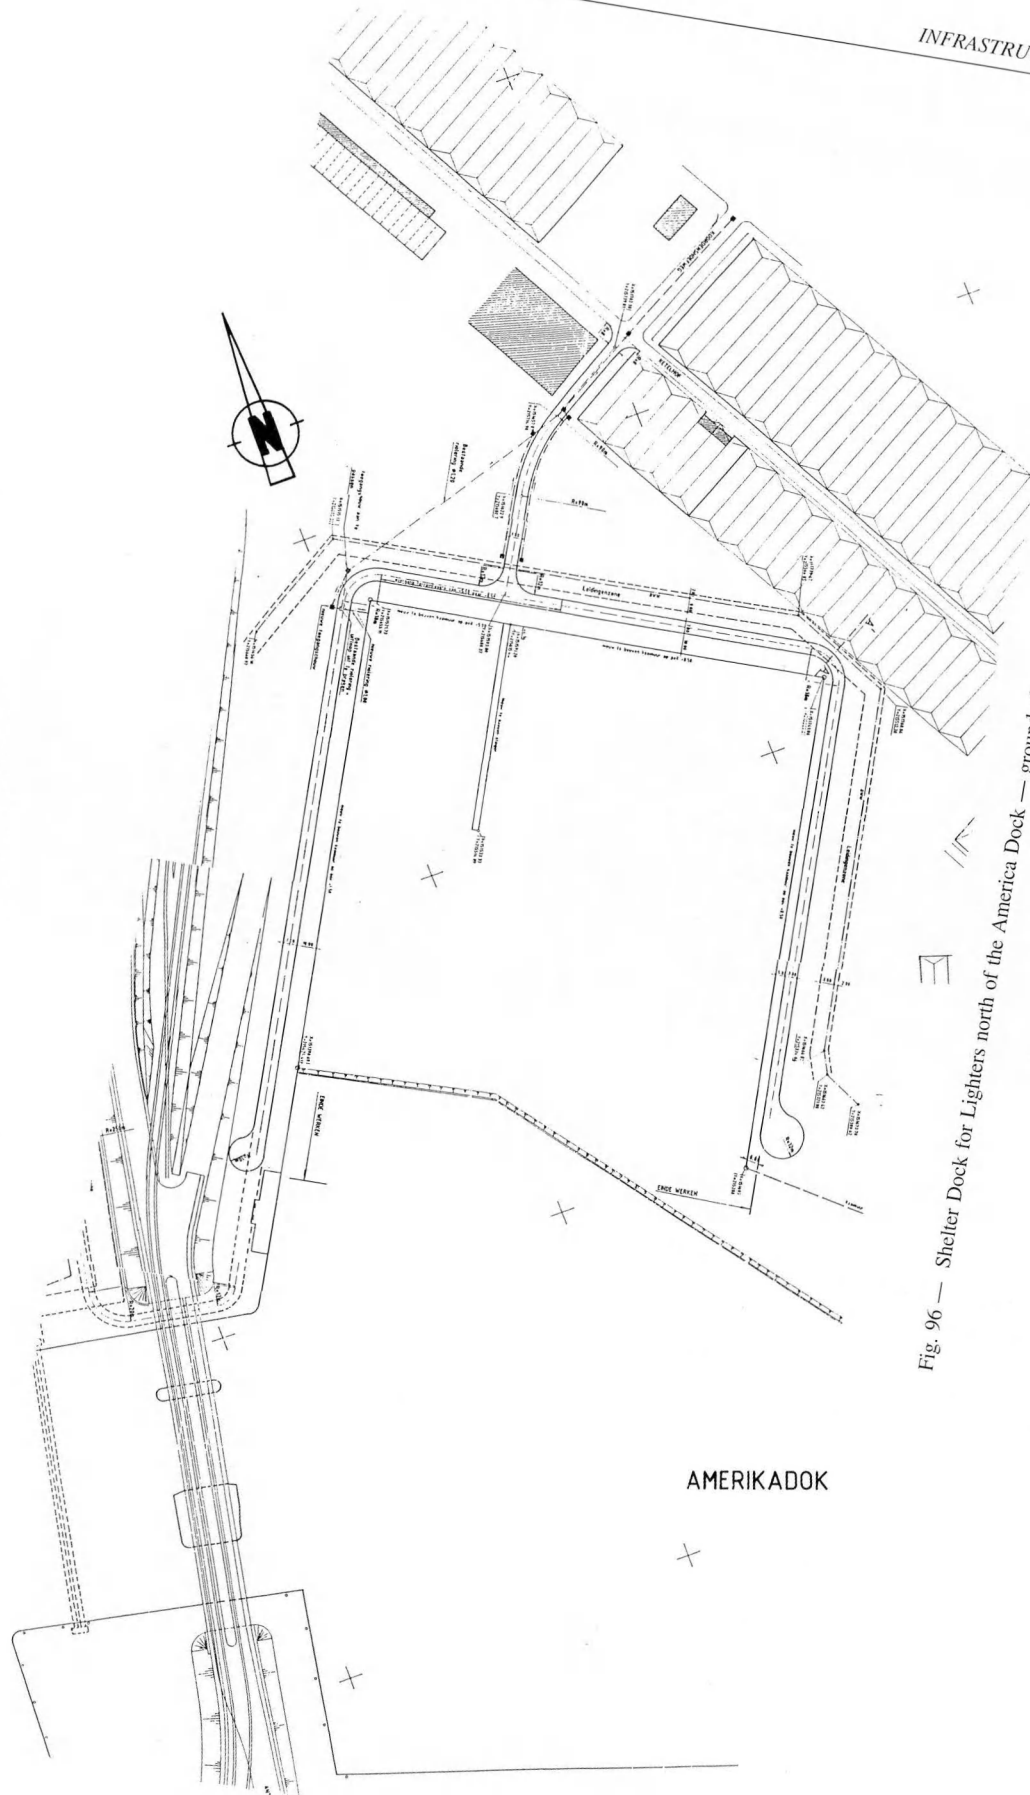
Shelter Dock for Lighters north of the America Dock — ground plan.
